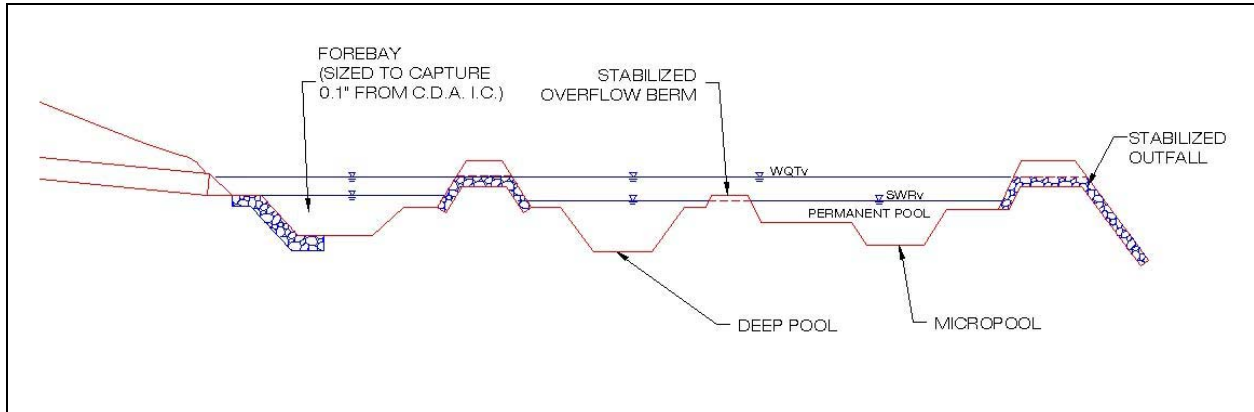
Typical Stormwater Wetland Cross-Section.
